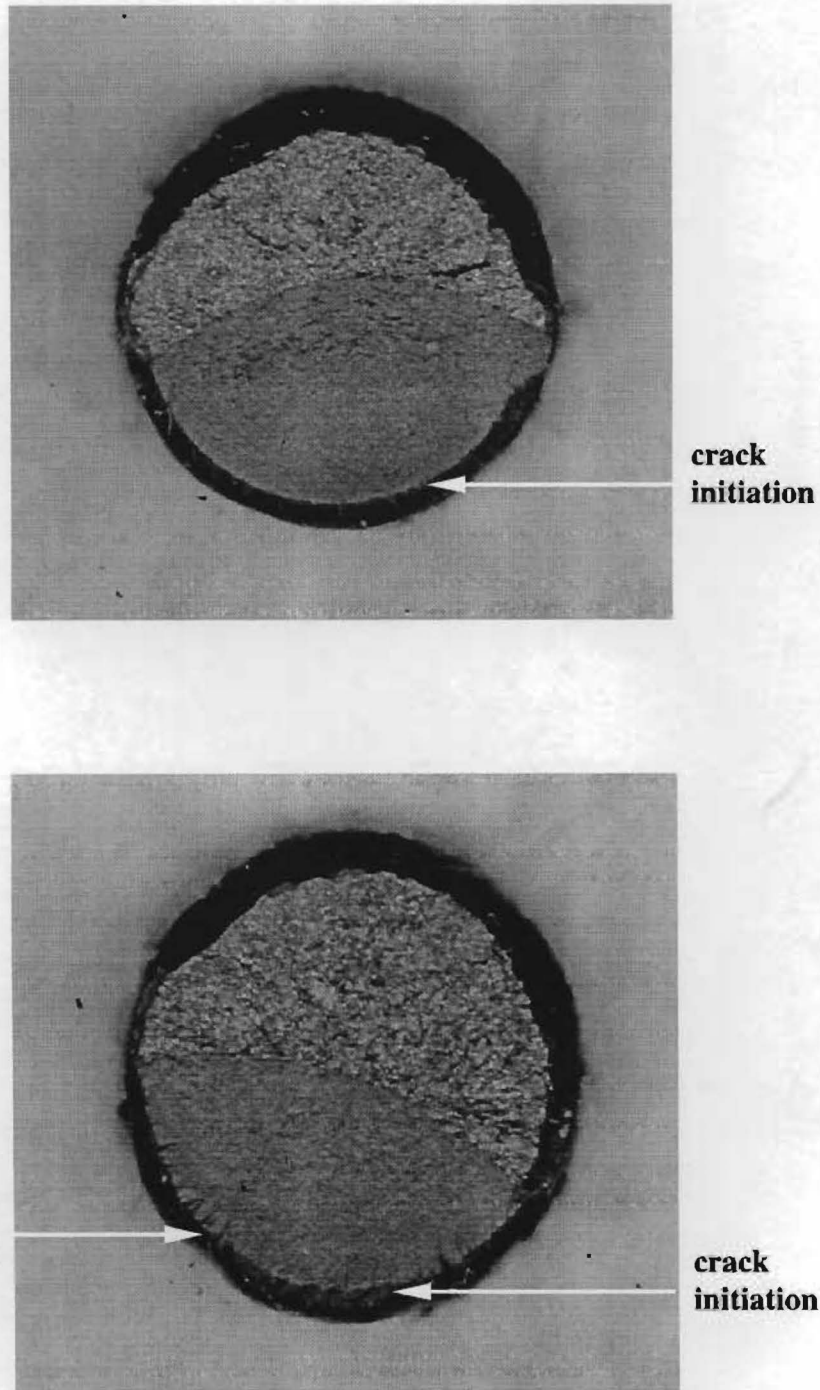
Fatigue Crack Surfaces on SMI4S60 Bars
